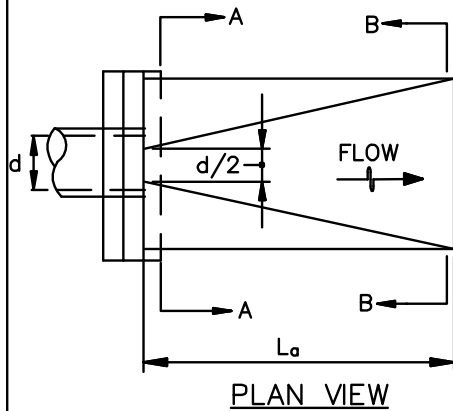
A ROCK OUTLET PROTECTION I
